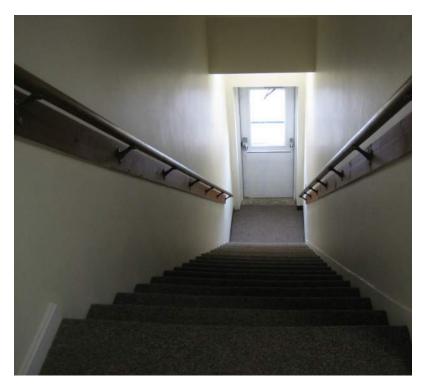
TYPICAL STAIR - CARPET TO BE REPLACED WITH RUBBER TREADS & RISERS
